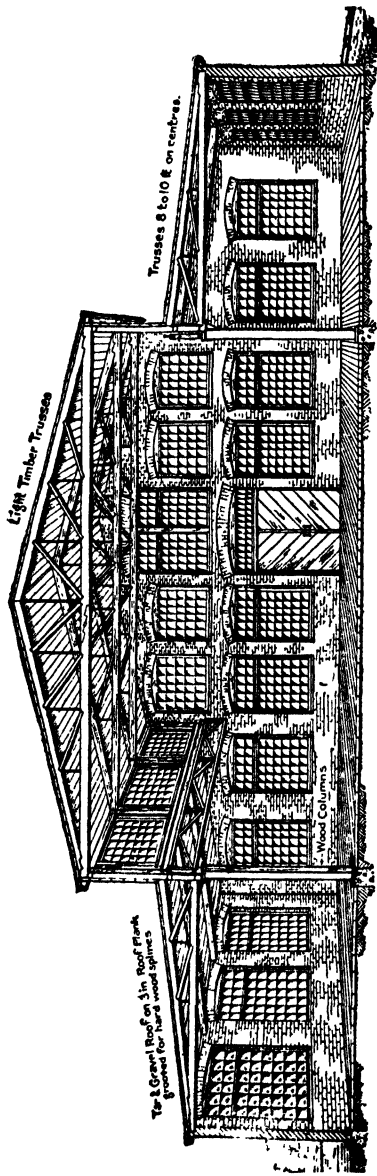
One-story Work-shop Roof-boards on Trusses.
